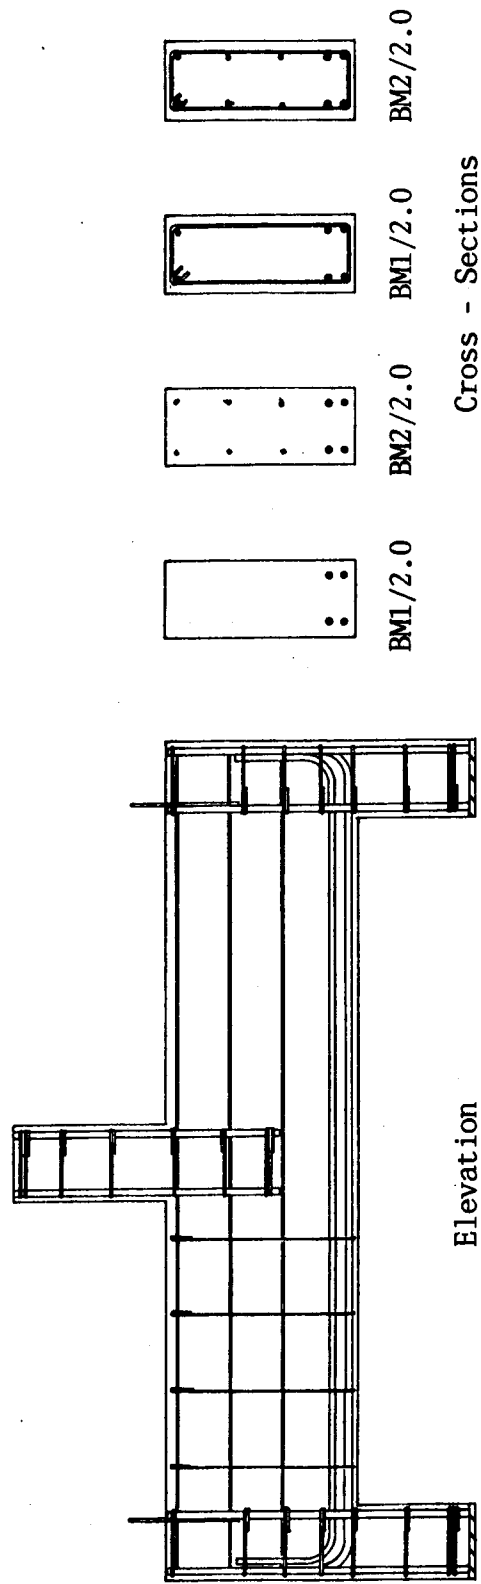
Beam 1/2.0 and 2/2.0 Reinforcement Details
